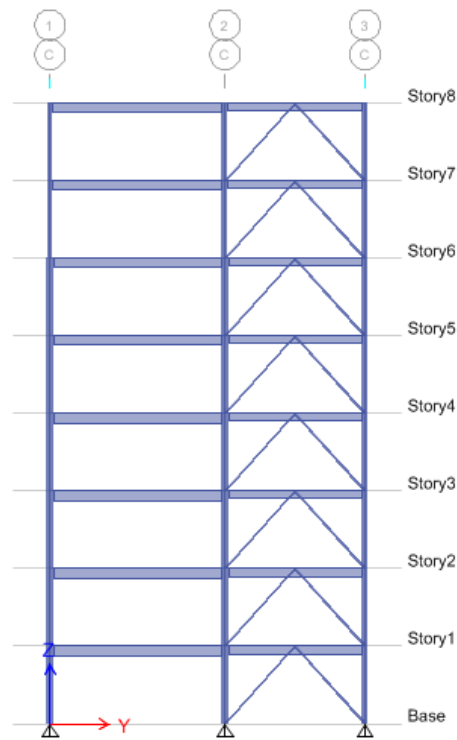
Typical I-beam and bracing elevation of the dormitory building (RB-I) in y-direction.
